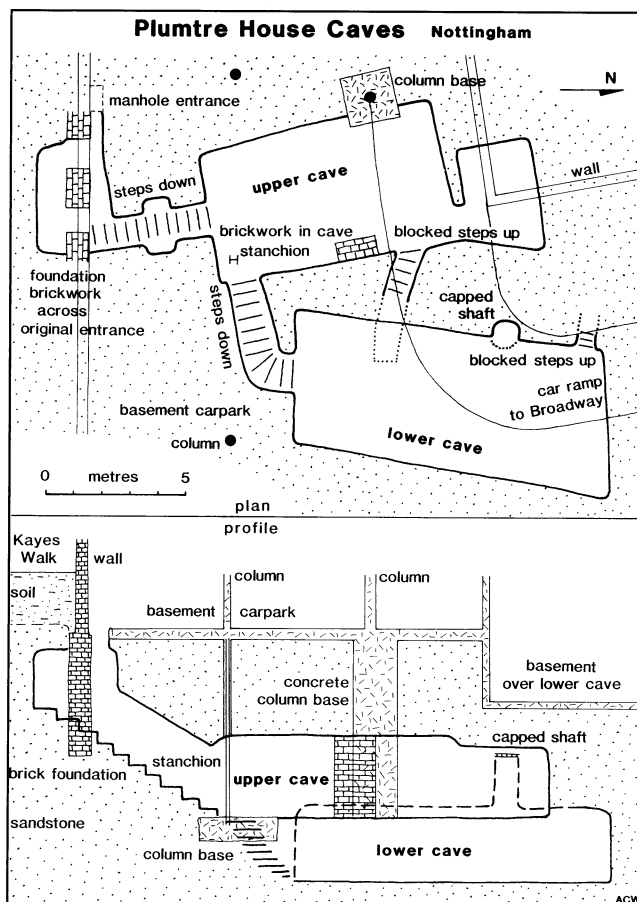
The caves that once lay beneath Plumtre House, with the foundation works of brick, concrete and steel for the redeveloped Victorian factory which now occupies the Lace Market site. (Survey by Tony Waltham, Jenny Walsby and Angus Tillotson).
